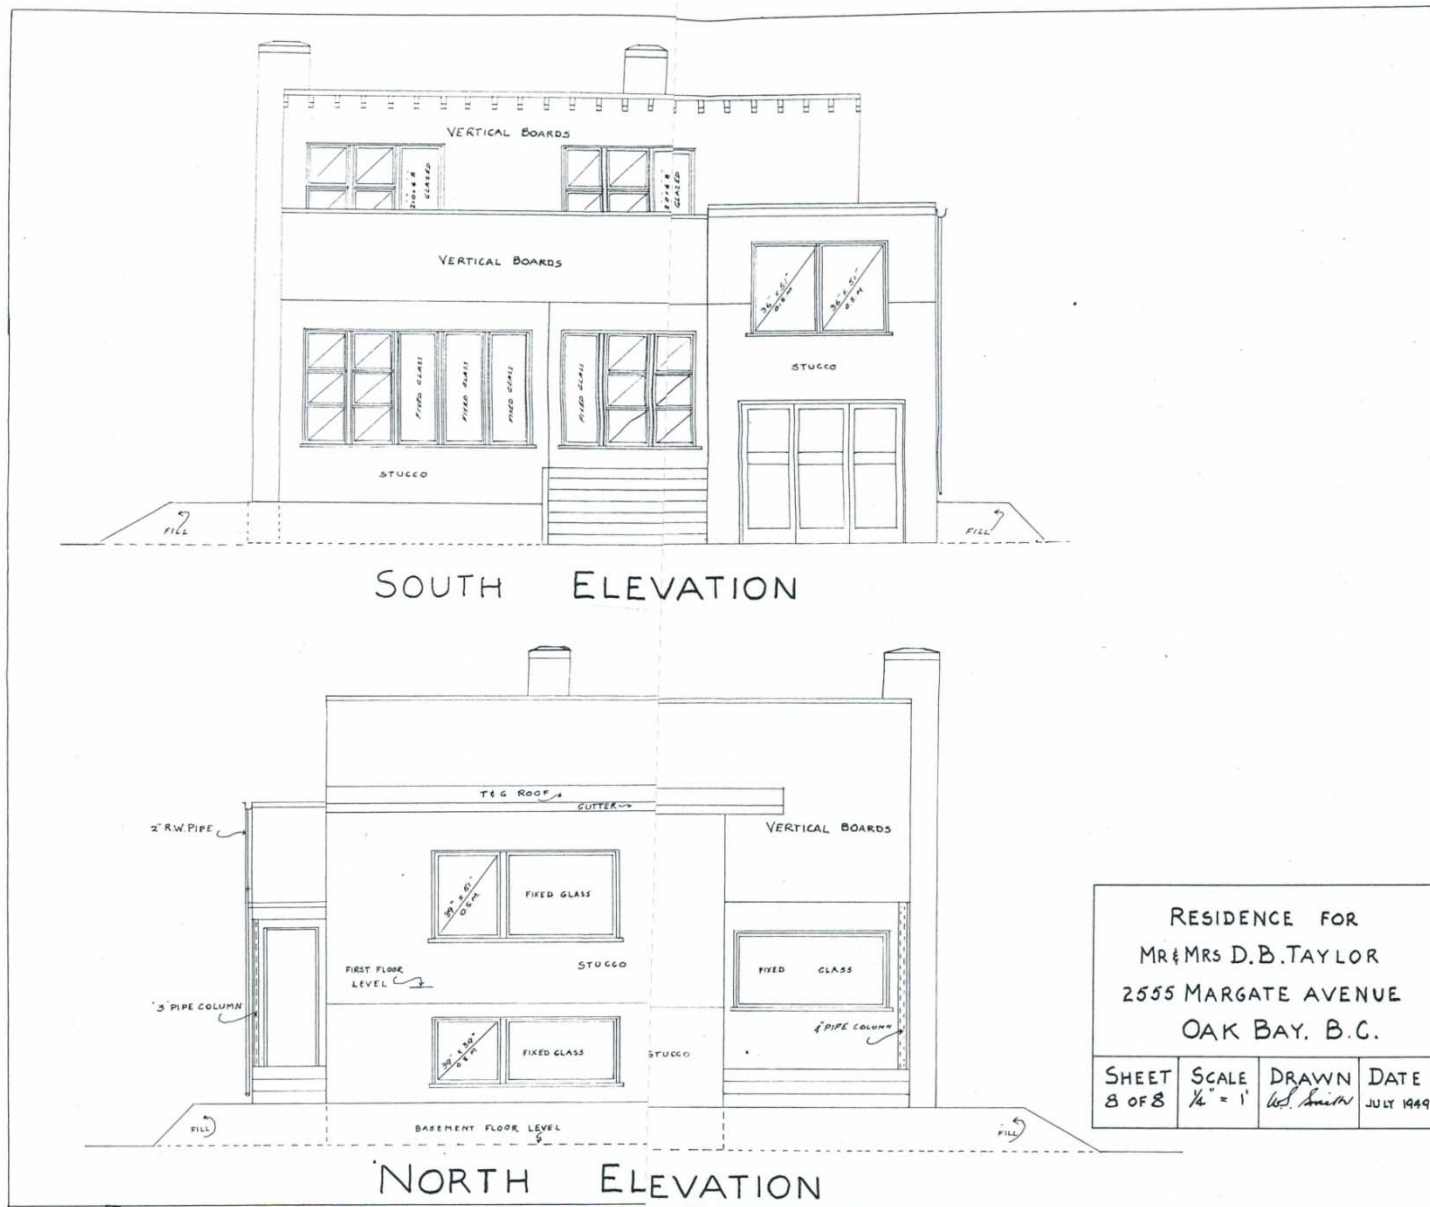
Sheet 8 of 8 of the plans that Faye's father drew for Faye and Don Taylor's house at 2555 Margate Avenue. The north elevation faces the street and represents the front facade of the modern flat-roofed house.
